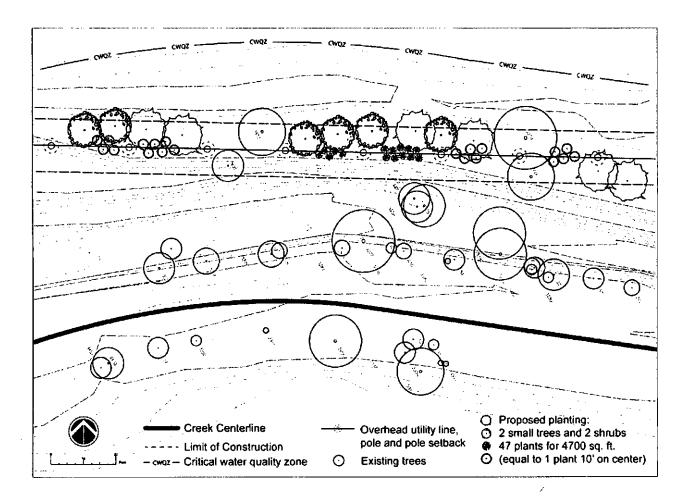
S.5-1: Example of Rooted Plant Layout and Calculation
